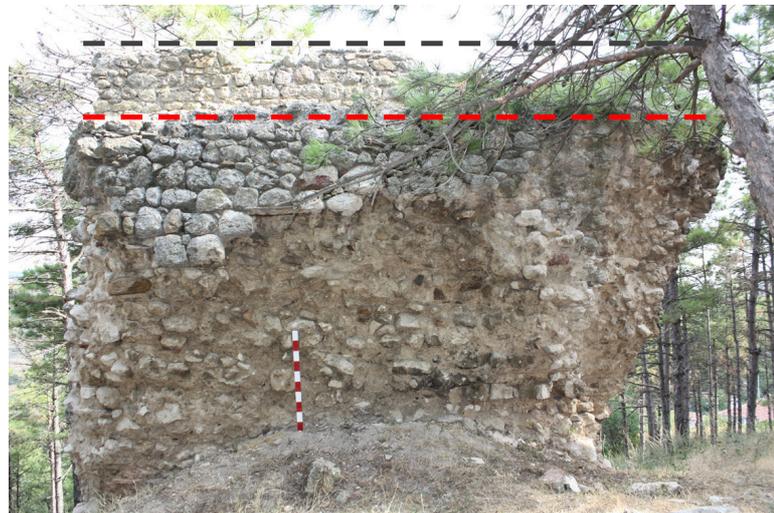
W3, wall walk and the parapet on the south (inner) façade, image by author (2012).
